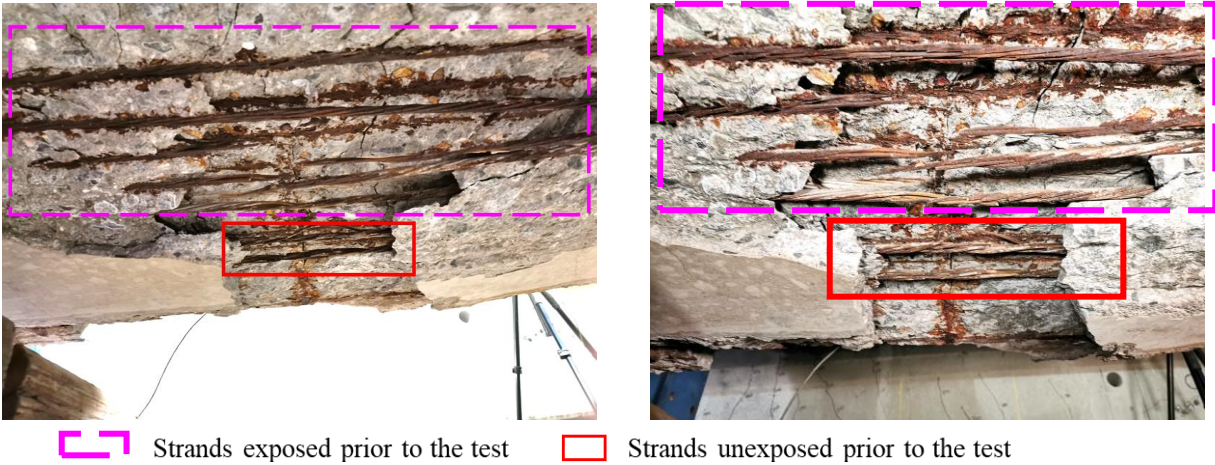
Failure Section in Test-2 on Box Beam-3 Showing Strands Unexposed before the Test
